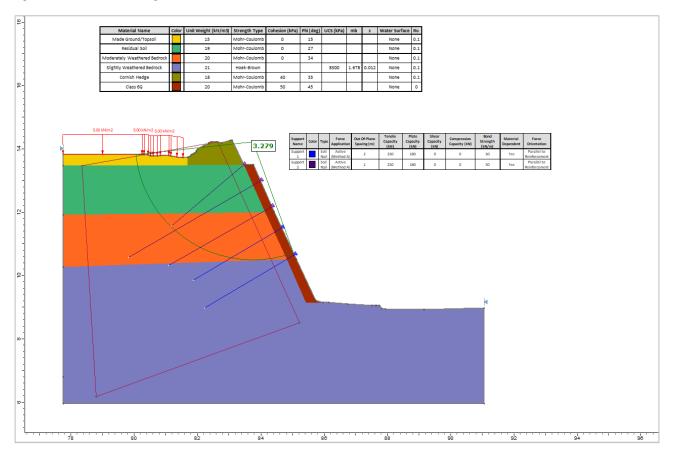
Section 5 – Facing Installation - BS8006 Set2
